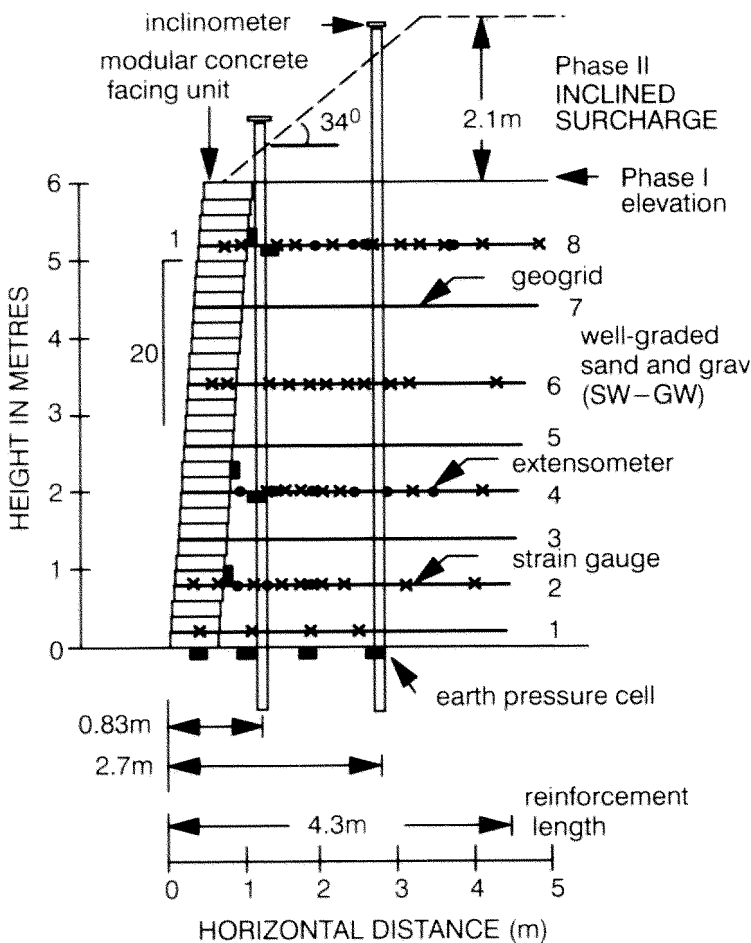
Cross-section and instrumentation of Algonquin wall.
